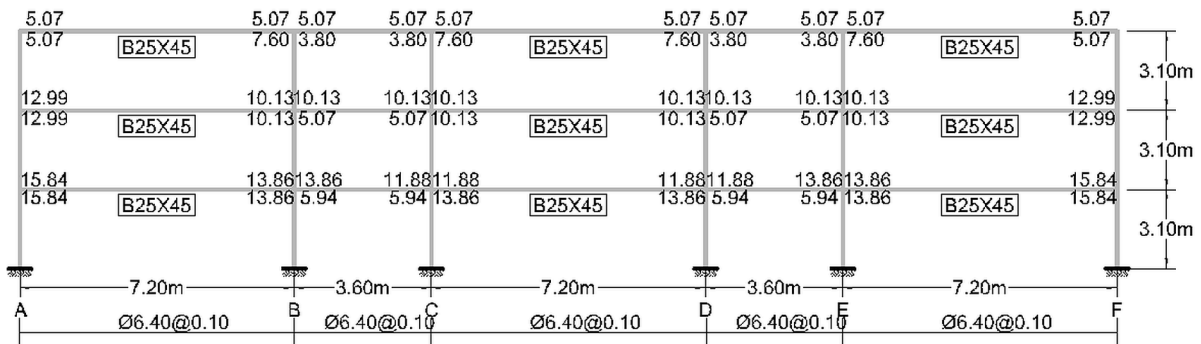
Educational facility, geometry and reinforcement in columns of the Frame 6
